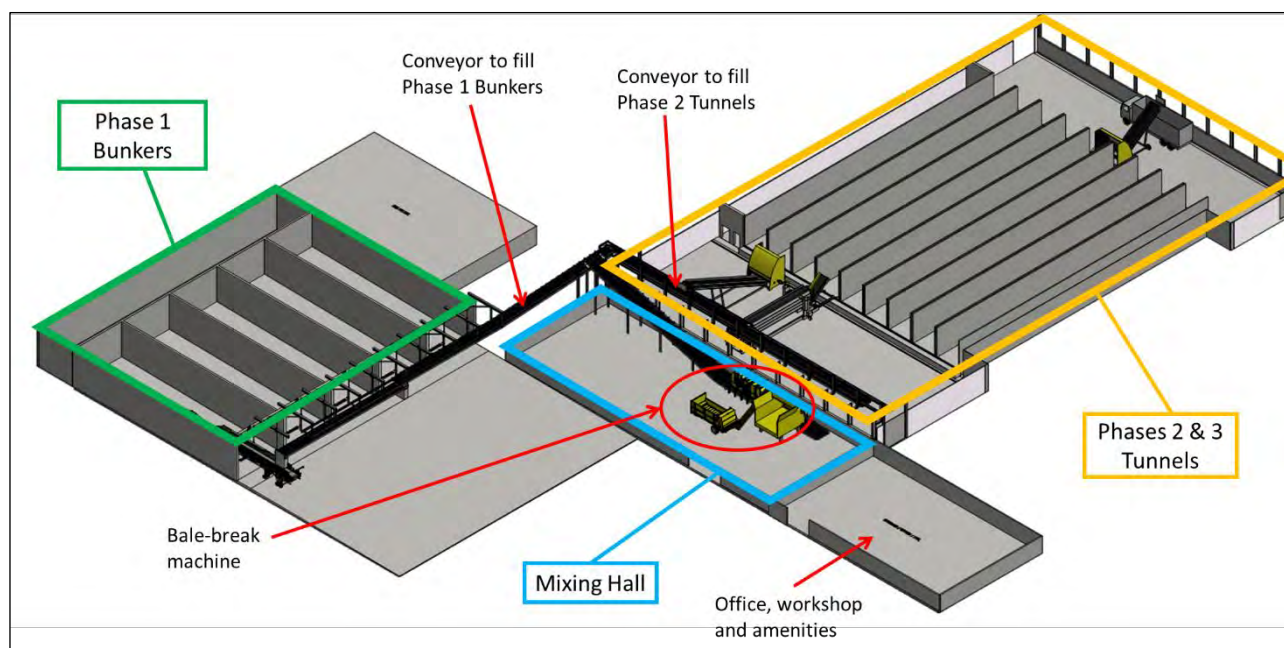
Schematic view of Phase 1 Bunkers, Mixing Hall, and Phase 2 Tunnels.
